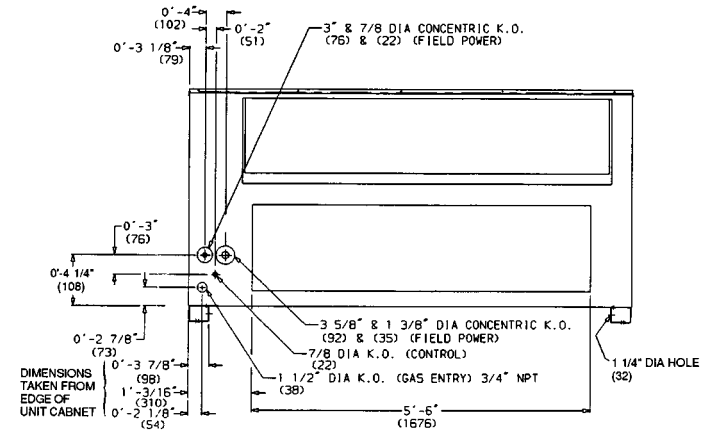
Base Unit Dimensions, 48HJ015,017
